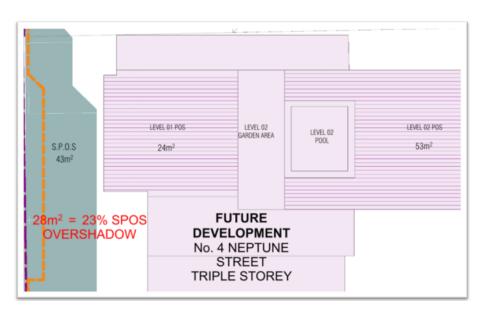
1pm, 2pm, 3pm shadows at No. 6 Neptune Street
